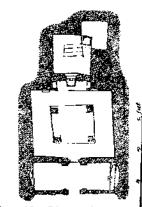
Plan of Jaina Cave 3, Ankai-Tankai.
